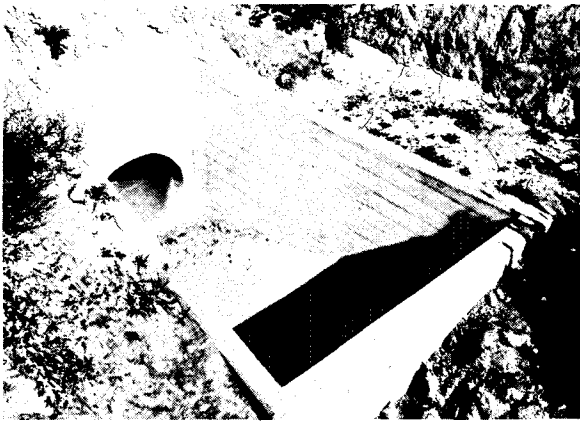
Type 4 inlet concrete transition. P-328-701-9300
